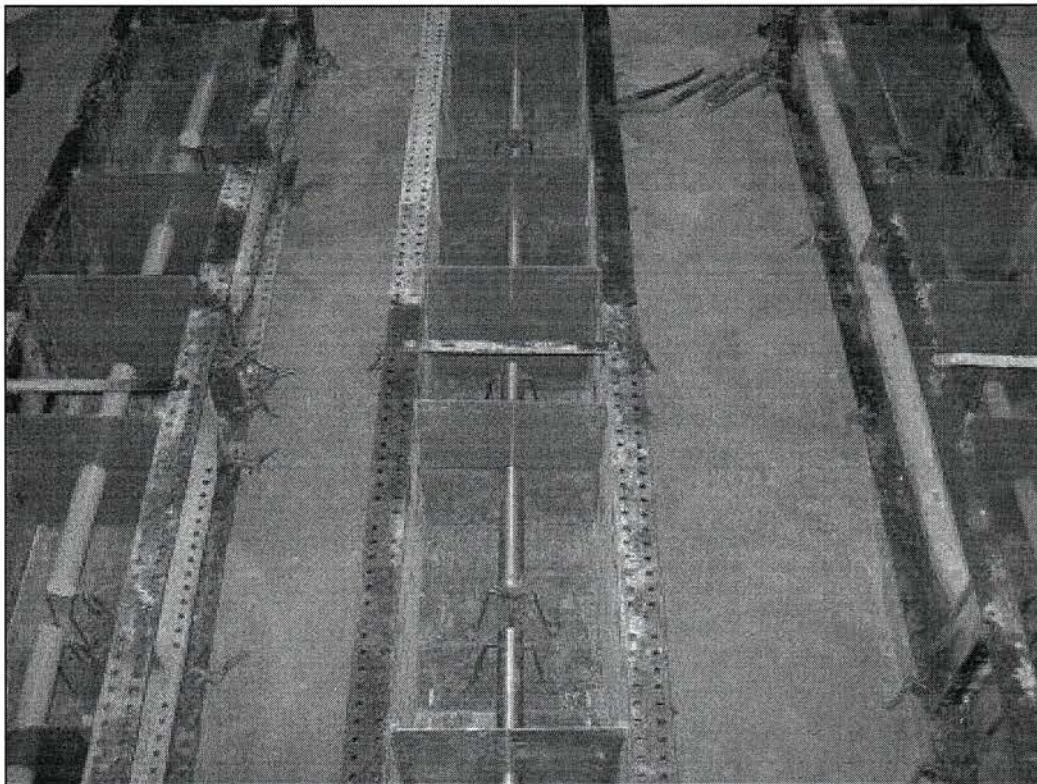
Troughs for constructing Modified AASHTO T253 specimens
